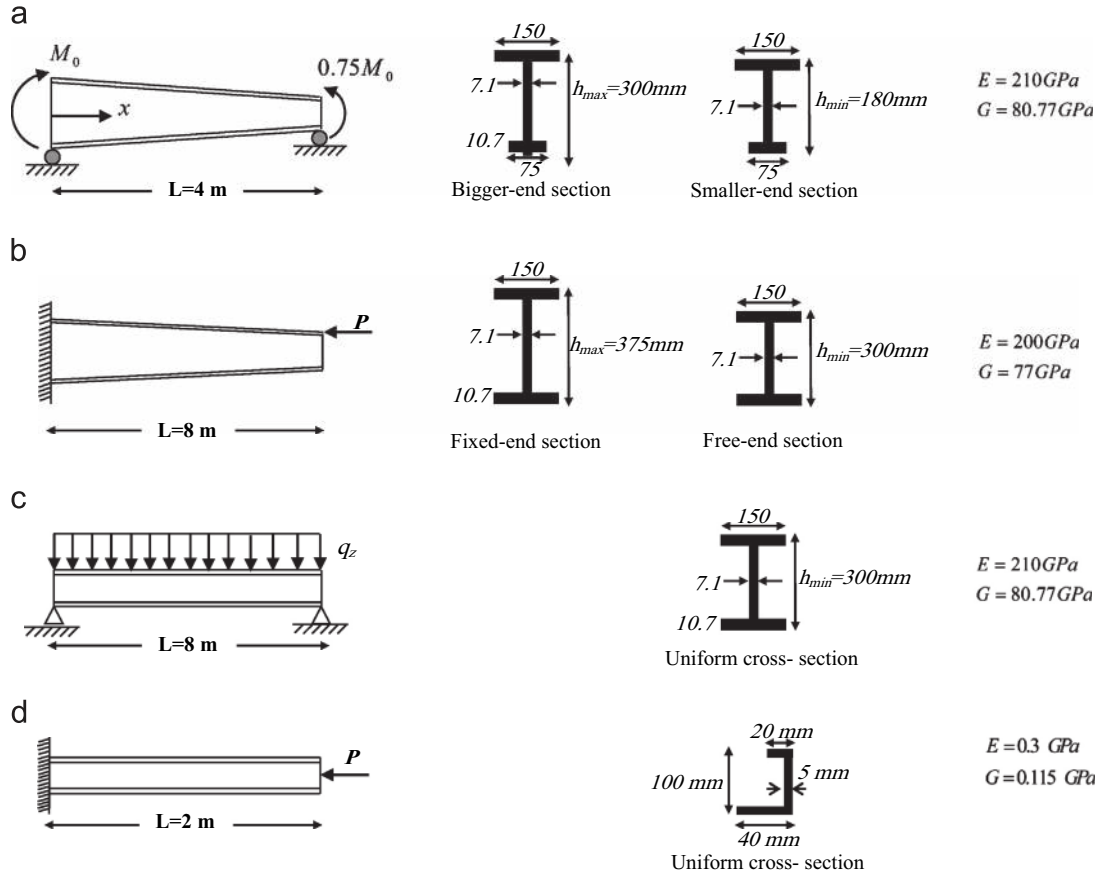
Cantilevers and simply supported beams with different cross-sections shapes: geometry, loading and material data.
